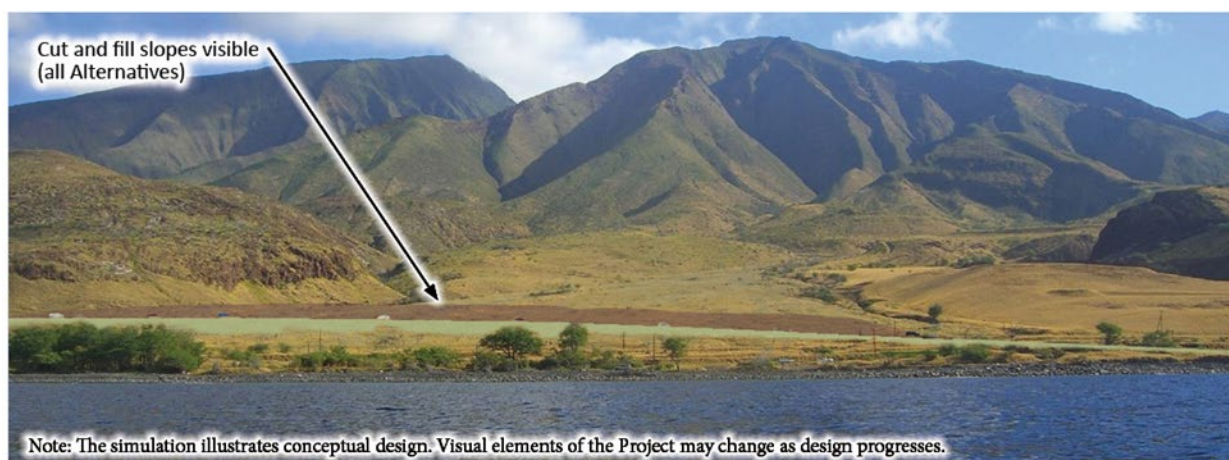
Key Viewpoint 13 – ‘Au‘au Channel: Existing Conditions/No Build Alternative and Build Alternatives 1 through 4 (looking east)
